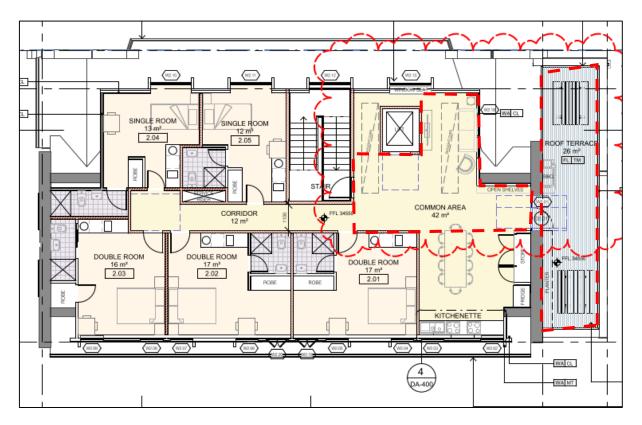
location of the level 2 indoor communal living area and outdoor communal open area (roof terrace) shown dashed
